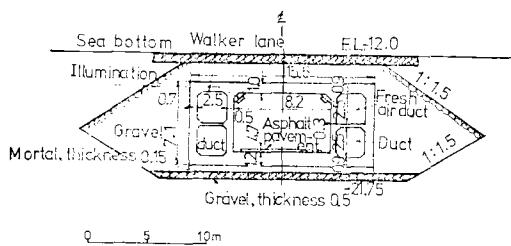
b. Kinura Port Under Water Tunnel (typical cross section)
